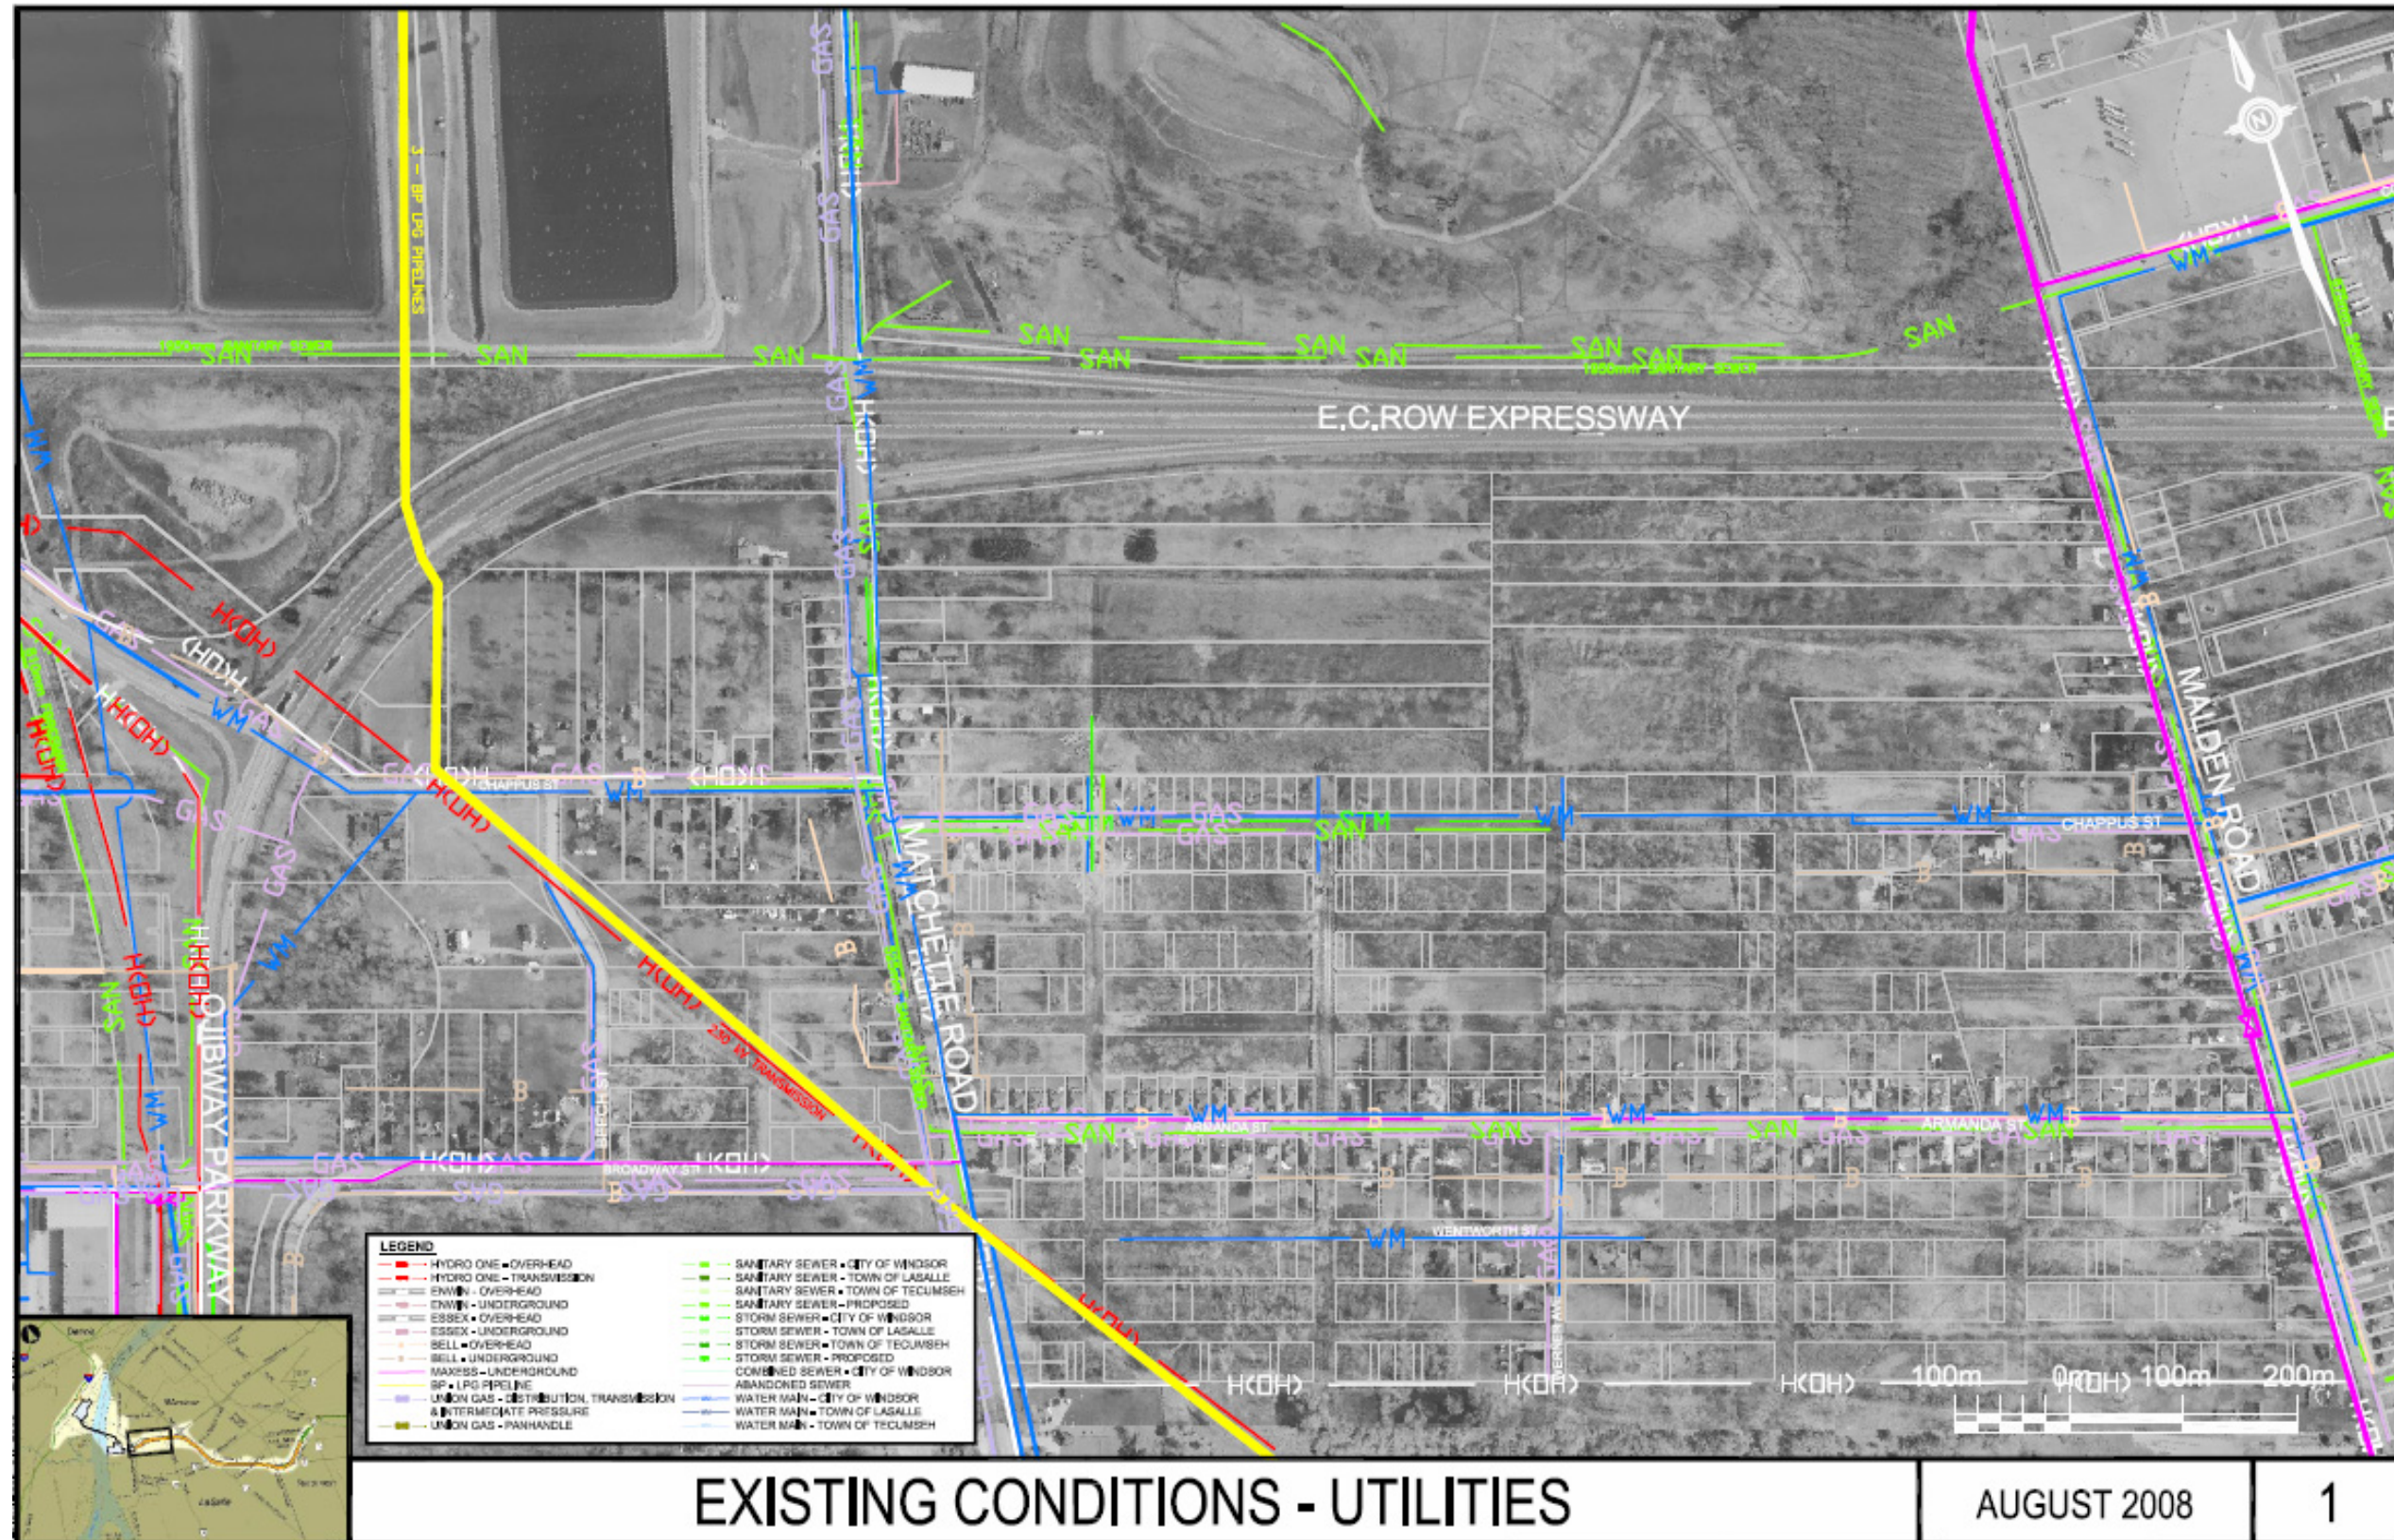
B – EXISTING UTILITY CONDITIONS (MALDEN ROAD TO GRAND MARAIS ROAD WEST)
